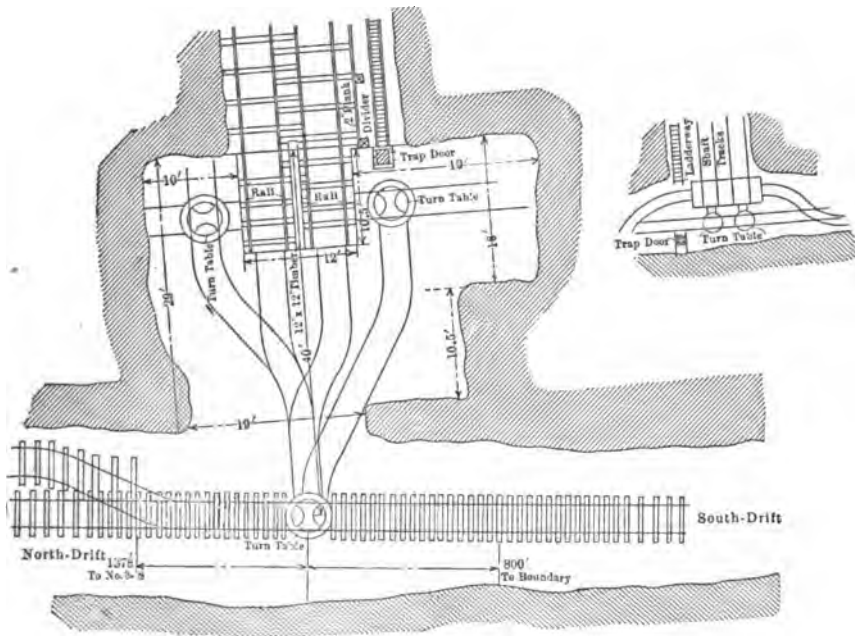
SHAFT STATIONS IN INCLINED SHAFTS.
